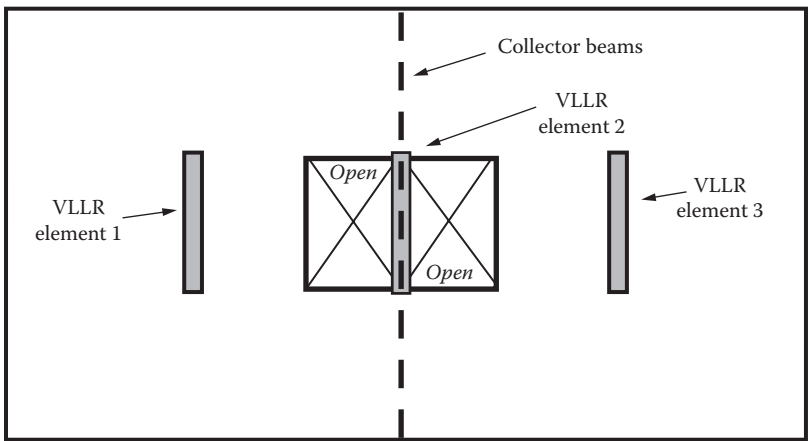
Isolate VLLR element with no direct connection to diaphragm: *Note:* Entire force for VLLR 2 must come through the collector beam. Beam and connections must be designed for these forces.
